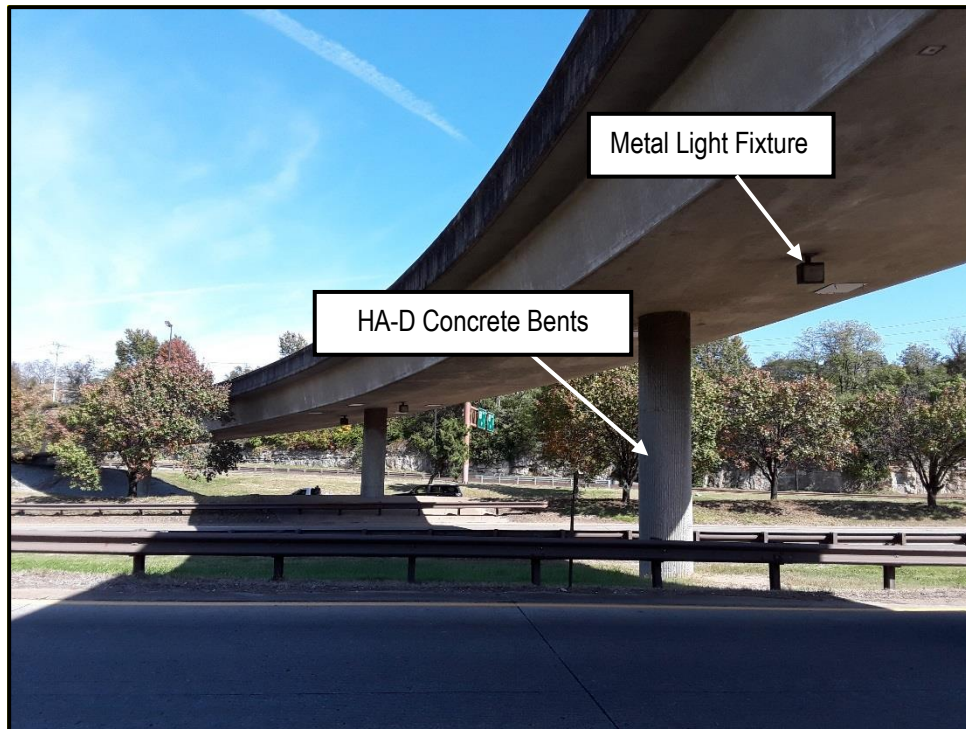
View of HA-D and metal light fixture on the SR-1 Ramp over I-440
